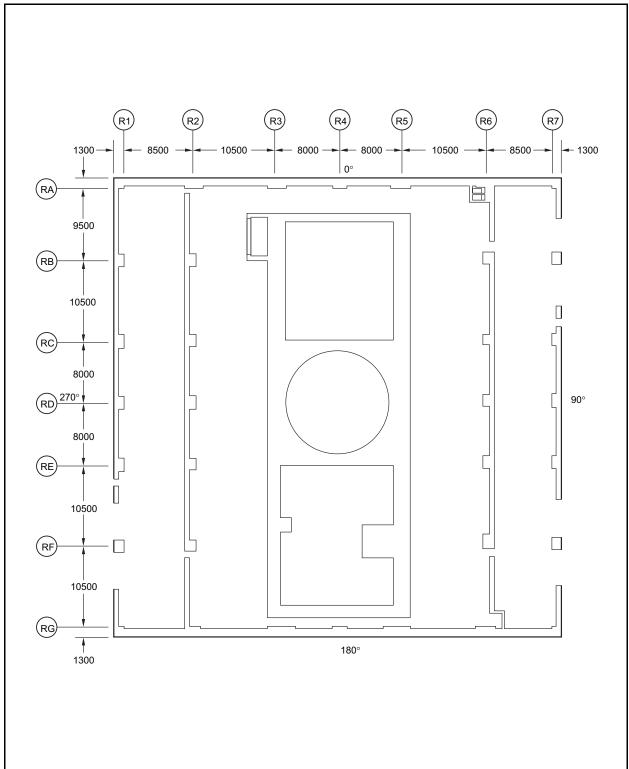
Reactor Building Arrangement Floor 3F Elevation 23500 mm
